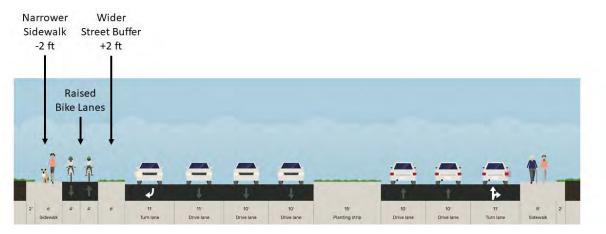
Montgomery Planning's Proposed Section on Georgia Avenue
